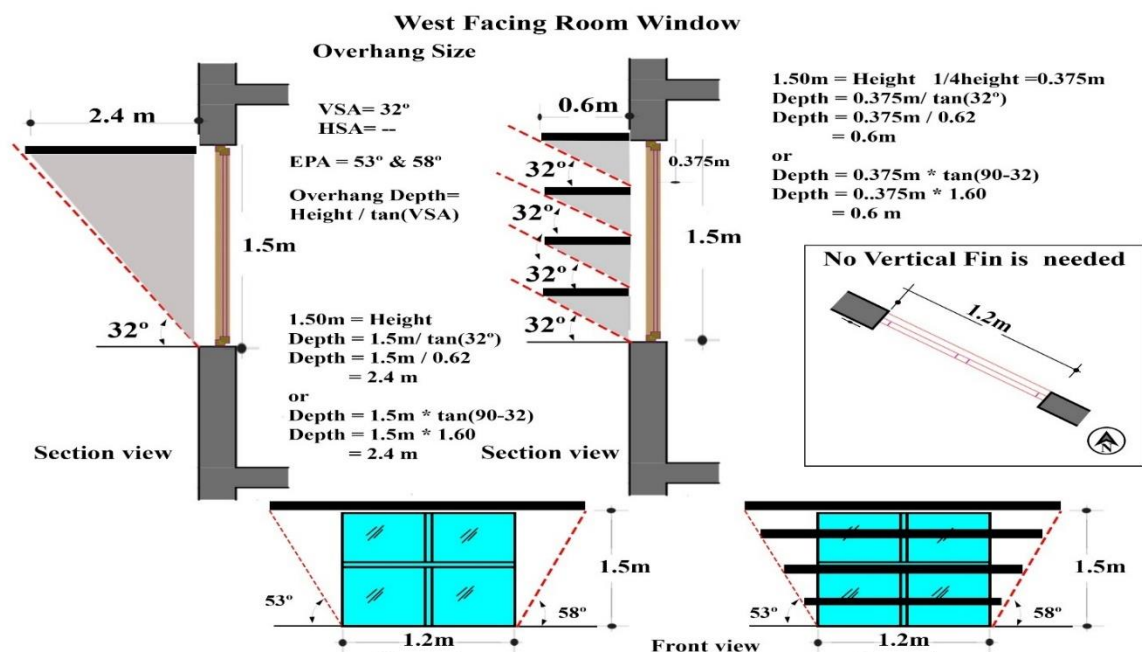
36: Calculation of west facing window overhang and fin size (Source: Author)
